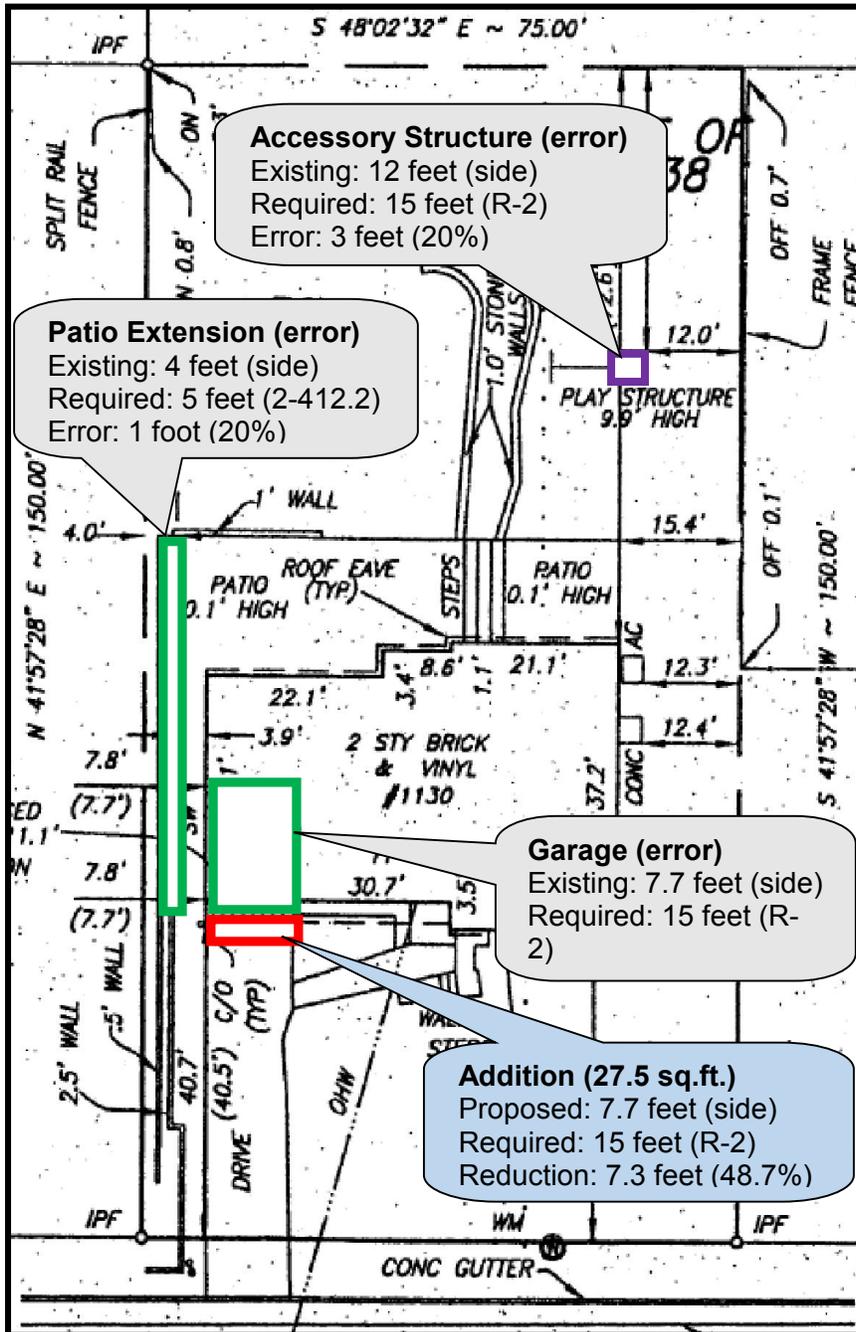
Special Permit plat, partial, showing the proposed addition and the areas proposed for errors in building location. Source: Applicant.
